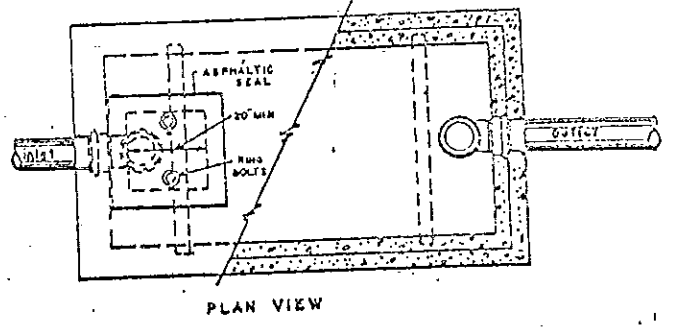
TYPICAL CONCRETE SEPTIC TANK
